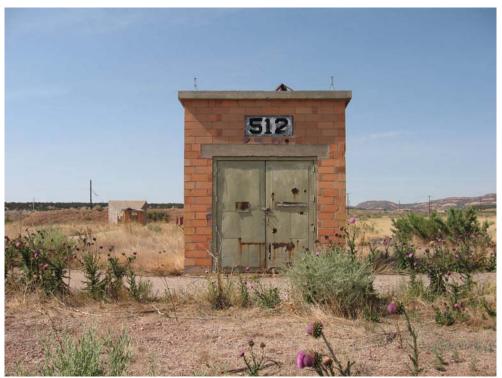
AOC 66, Building 512, looking south at exterior condition of building.
